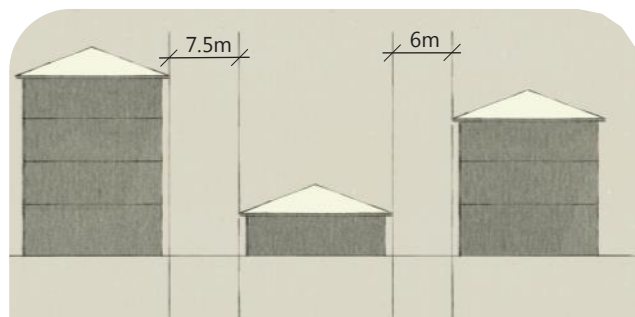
Set back taller buildings from any adjacent single residential houses
